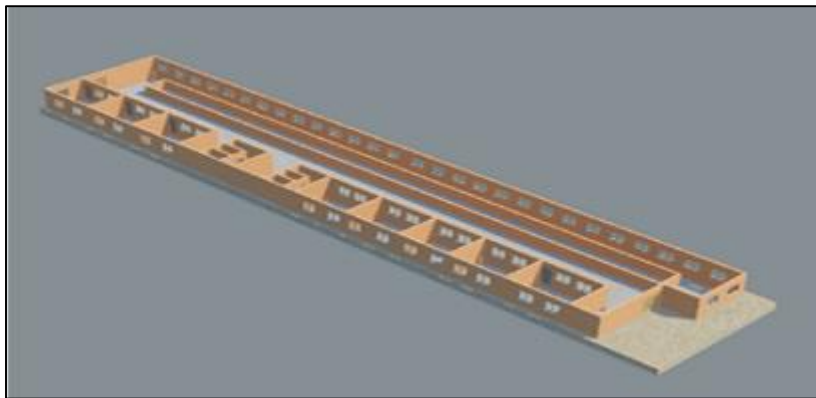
Elevations of the towing tank floor (ground floor) of the CoE.
